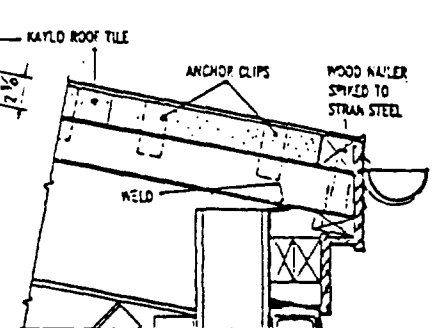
DETAILS OF ANCHORS TO STRAN-STEEL SUB-PURLINS
